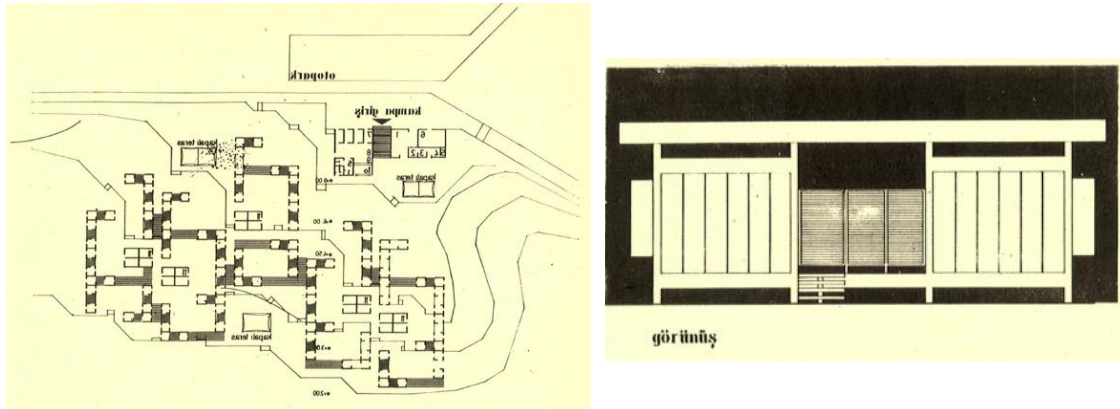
Modular systems proposed for Adana, Karataş Tourism Facilities. Left; site plan, right: elevation of the single unit. Drawings from 3rd prize-winning project (*Mimarlık*, 103(1972): 55)
